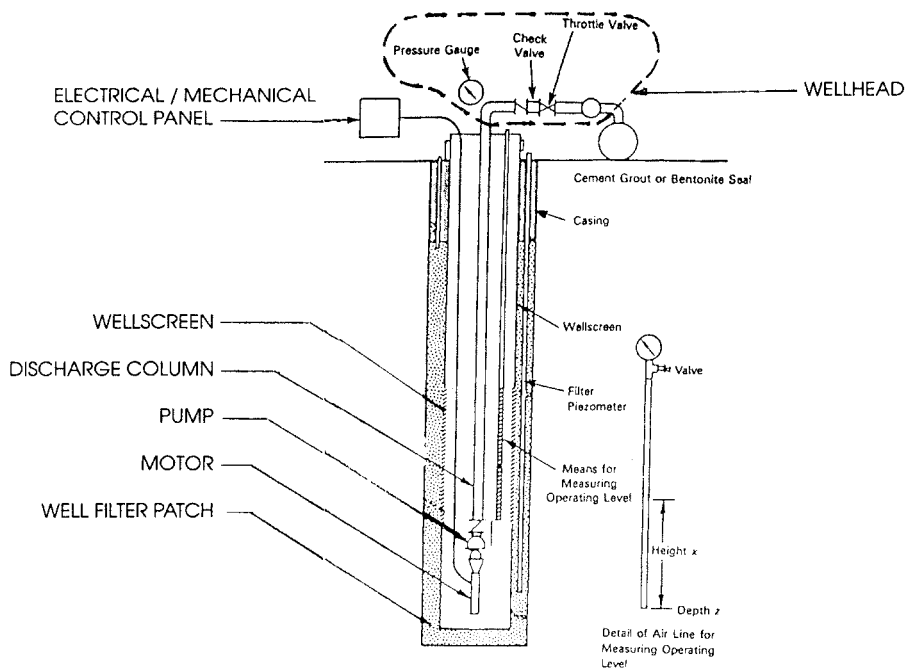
Typical groundwater extraction system. (From USEPA. 1995a. *Ground-Water and Leachate Treatment Systems*. EPA/625/R-94/005. Washington, DC.)
